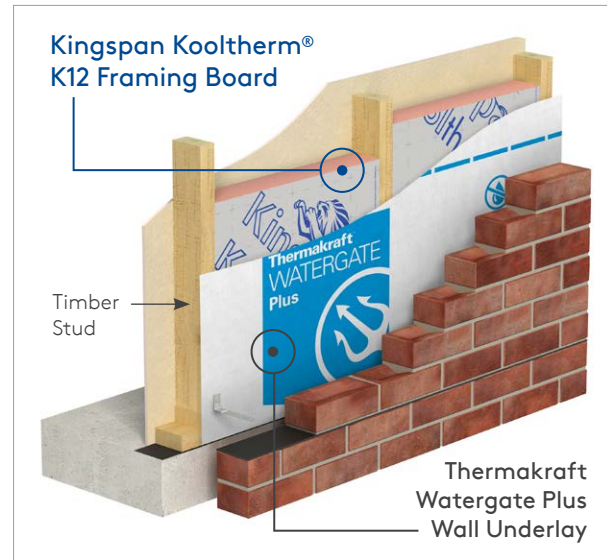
Kooltherm K12 Framing Board fitted between timber wall studs.
